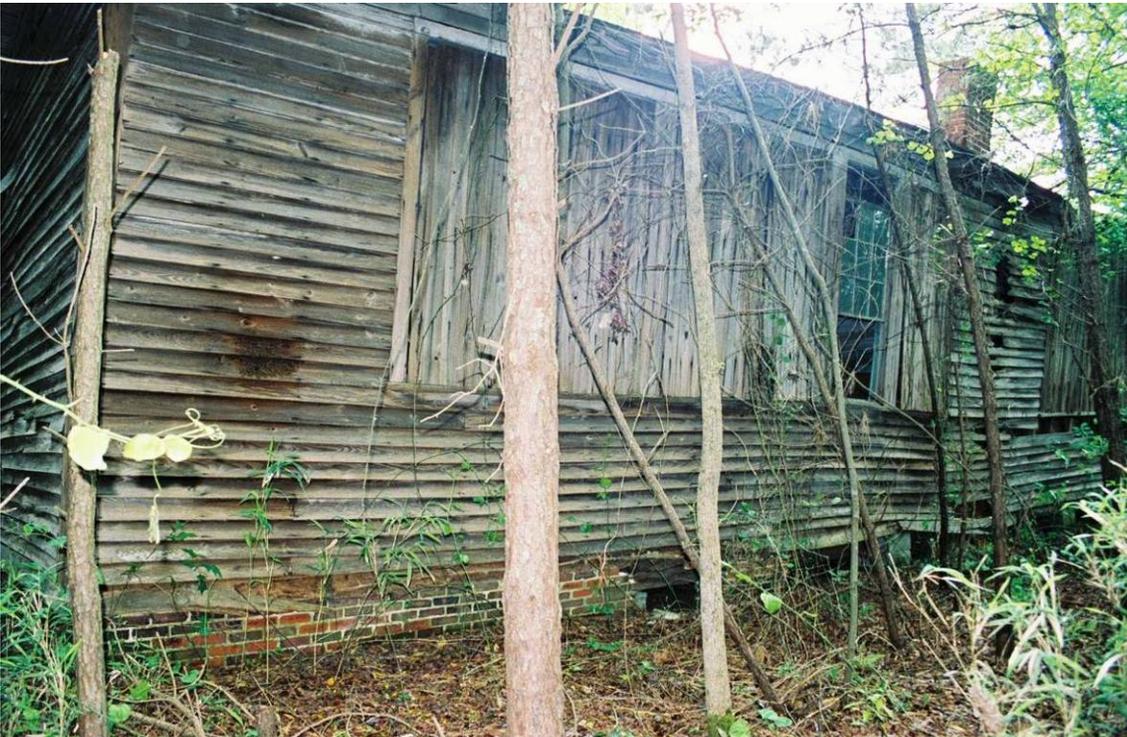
Coakley School: west rear elevation; note boarded-up windows of south classroom
